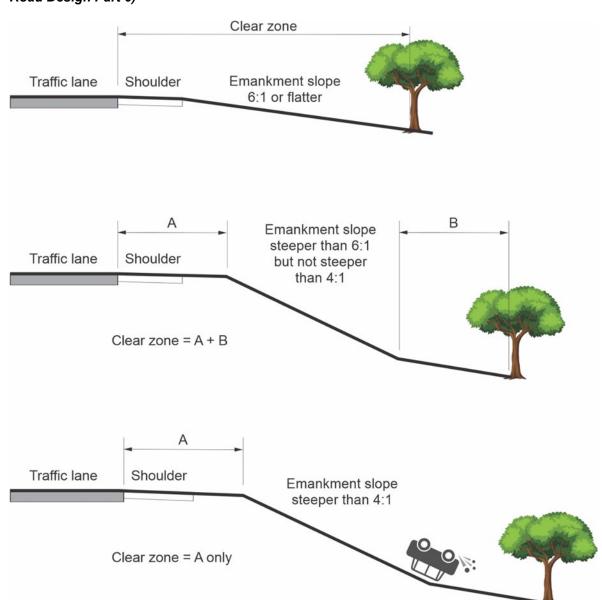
(f) – Examples illustrating clear zones on fill slopes (source: Austroads Guide to Road Design Part 6)
